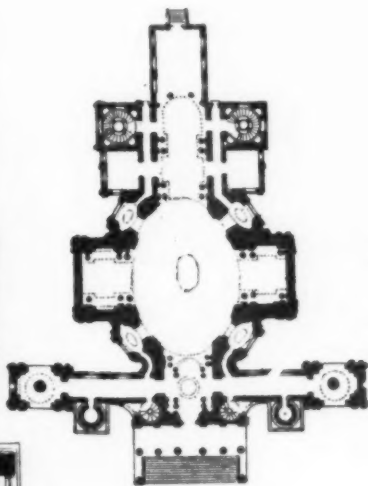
Plan of the Church of San Carlo Borromeo, Vienna.
